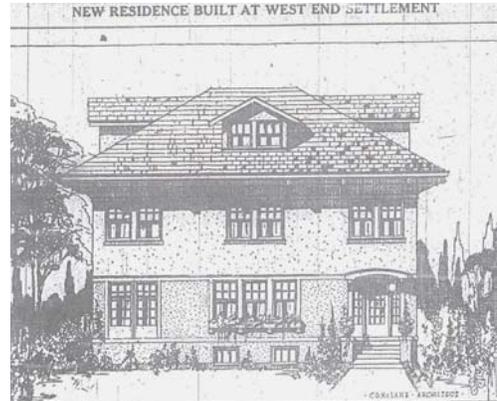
Above - Architect's drawing of WES Matron's house 1915 (Ref 8)
